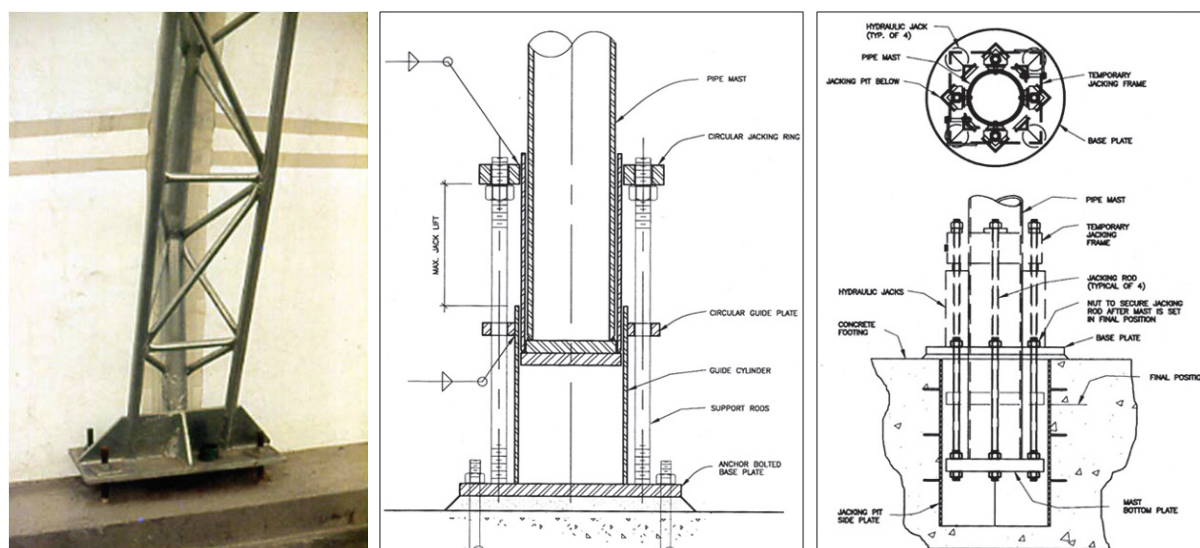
Base plates introduce pretension (Courtesy of M.Majowiecki). Figures 25, 26: Masts raised into position with portable hydraulic jacks [10]
